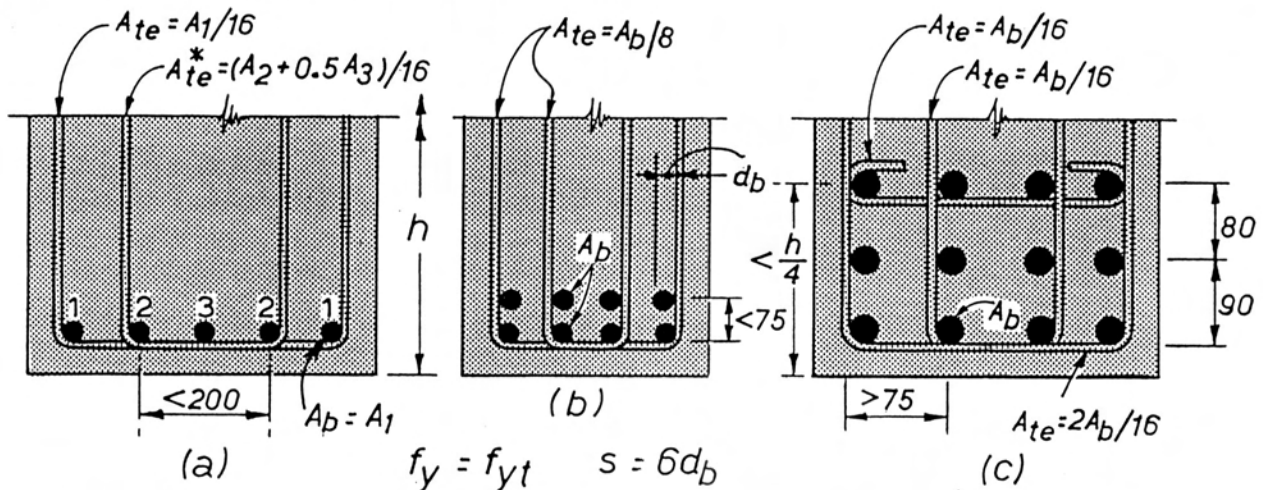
The arrangement and size of stirrup-ties at  $6d_b$  centres in potential plastic hinge regions.
